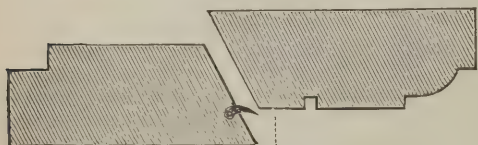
Vertical Section Through Meeting Rail with Everett's Improvement.
